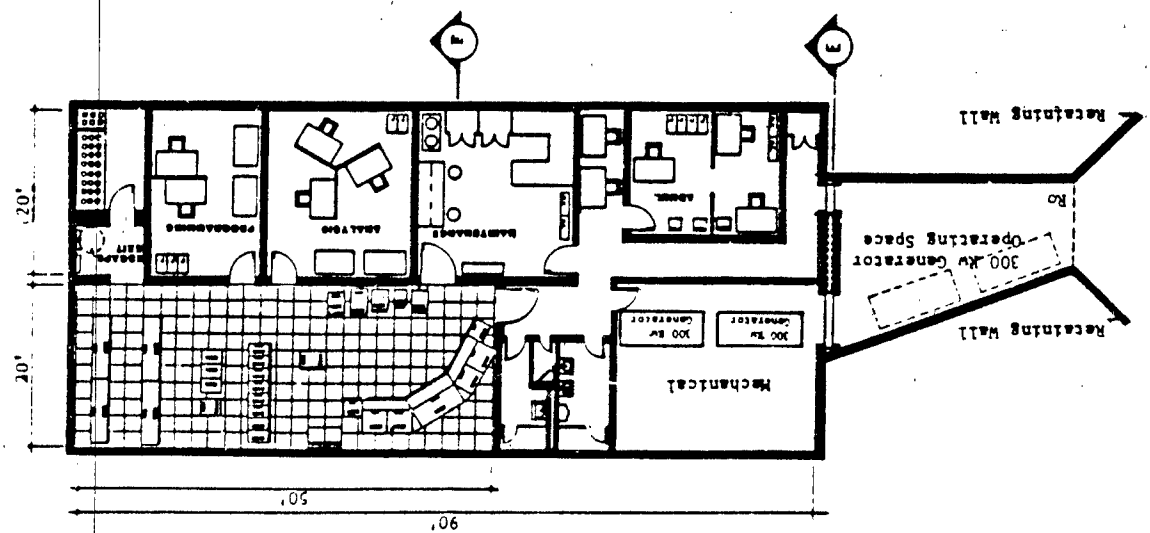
FLOOR PLAN--STAND-ALONE CONFIGURATION.
